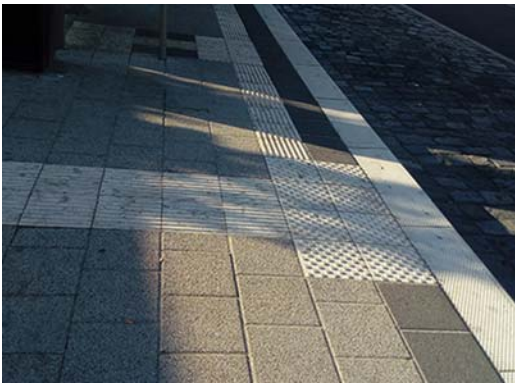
Bus stop marking, Wernyhory street. Source: the author
